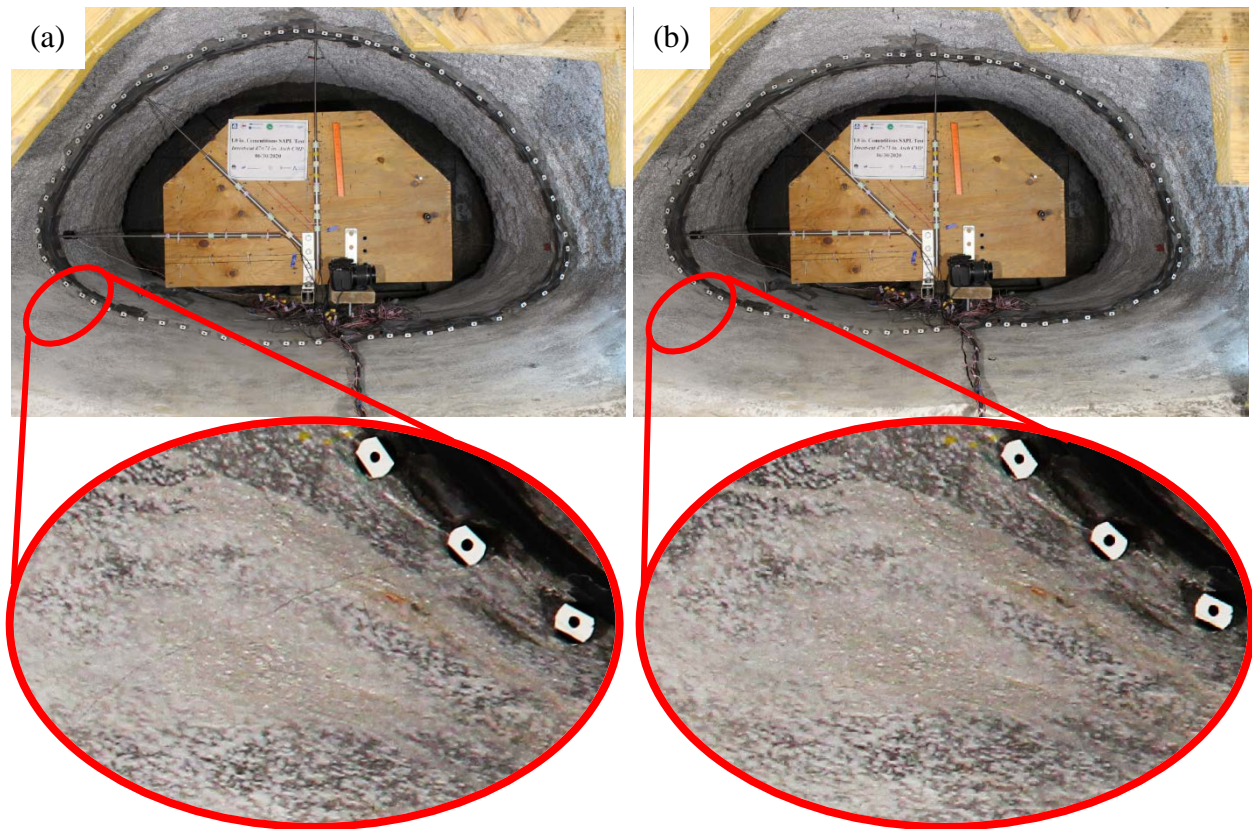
Invert-cut pipe arch renewed with 1 in. cementitious SAPL: (a) before loading, where the East haunch had a shrinkage crack, and (b) after loading, where the shrinkage crack is closed.
